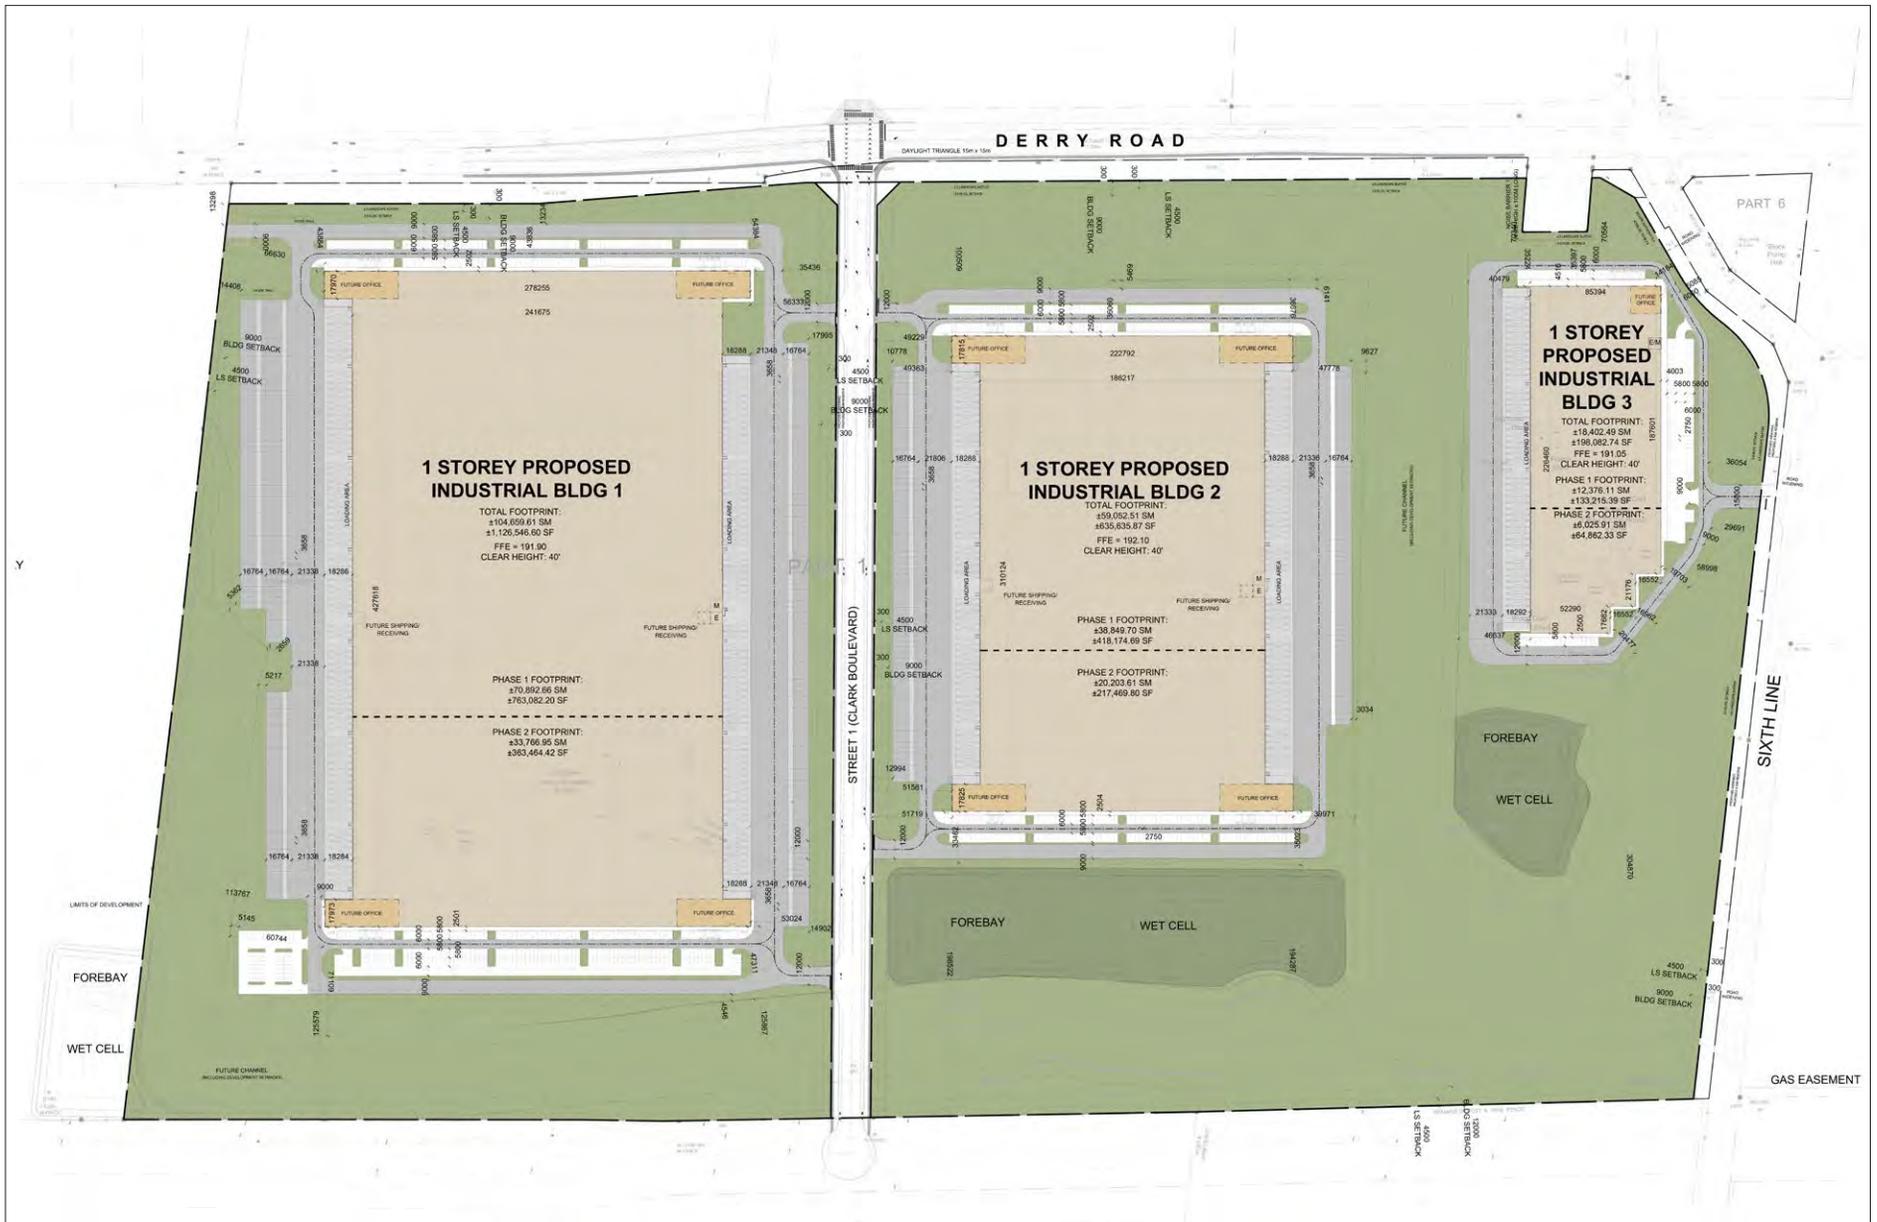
Proposed Conceptual Site Plan, prepared by Ware Malcomb.
